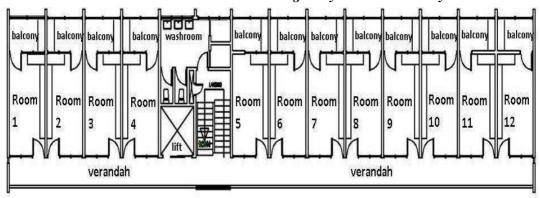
Typical floor plan of type B (1) and Type C (1) annex blocks
